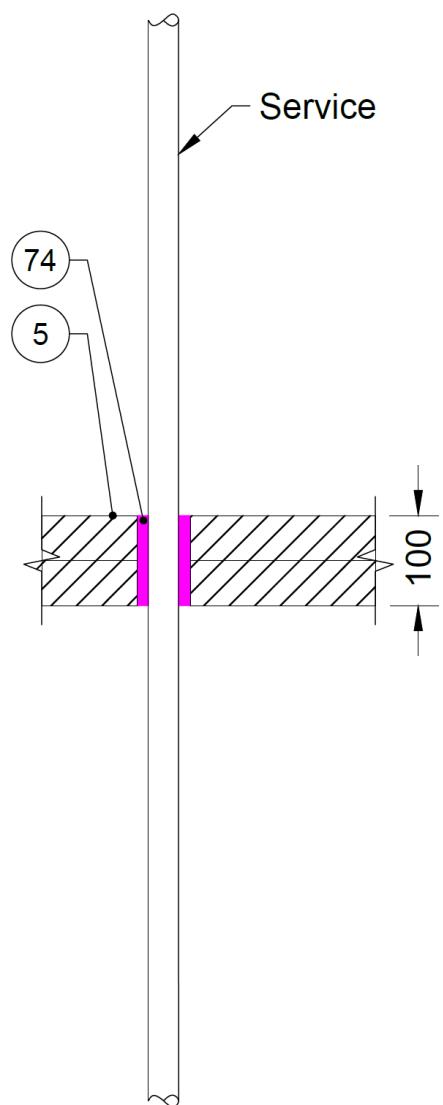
Section View of Pipes Installed in Horizontal Substrates
